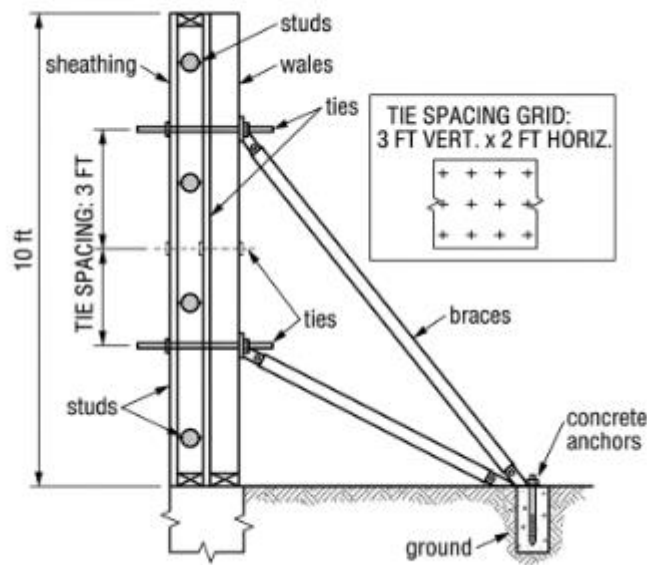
CROSS-SECTION DIAGRAM OF A WALL FORMWORK SYSTEM
